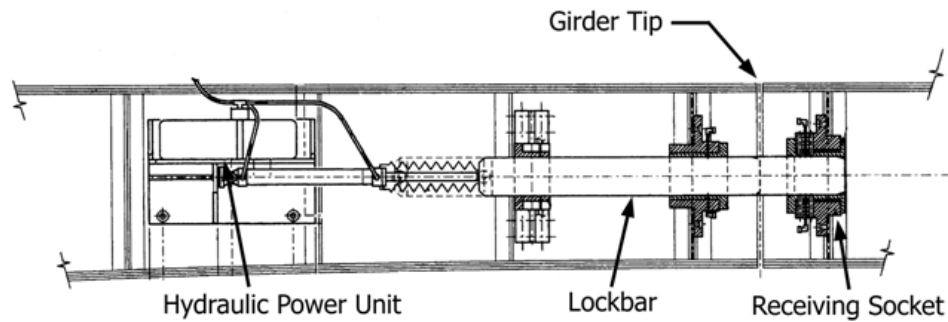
Lock Bar, Receiver and Hydraulic Unit (sketch adapted from Christa McAuliffe Bridge construction plans)
